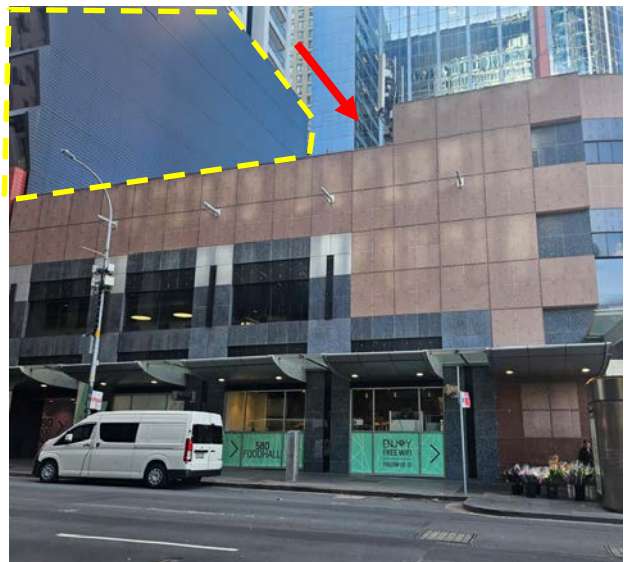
The Bathurst Street façade of the subject site marked by red arrow and the adjacent building shown in yellow dash. The PP massing will be aligned with this building.
